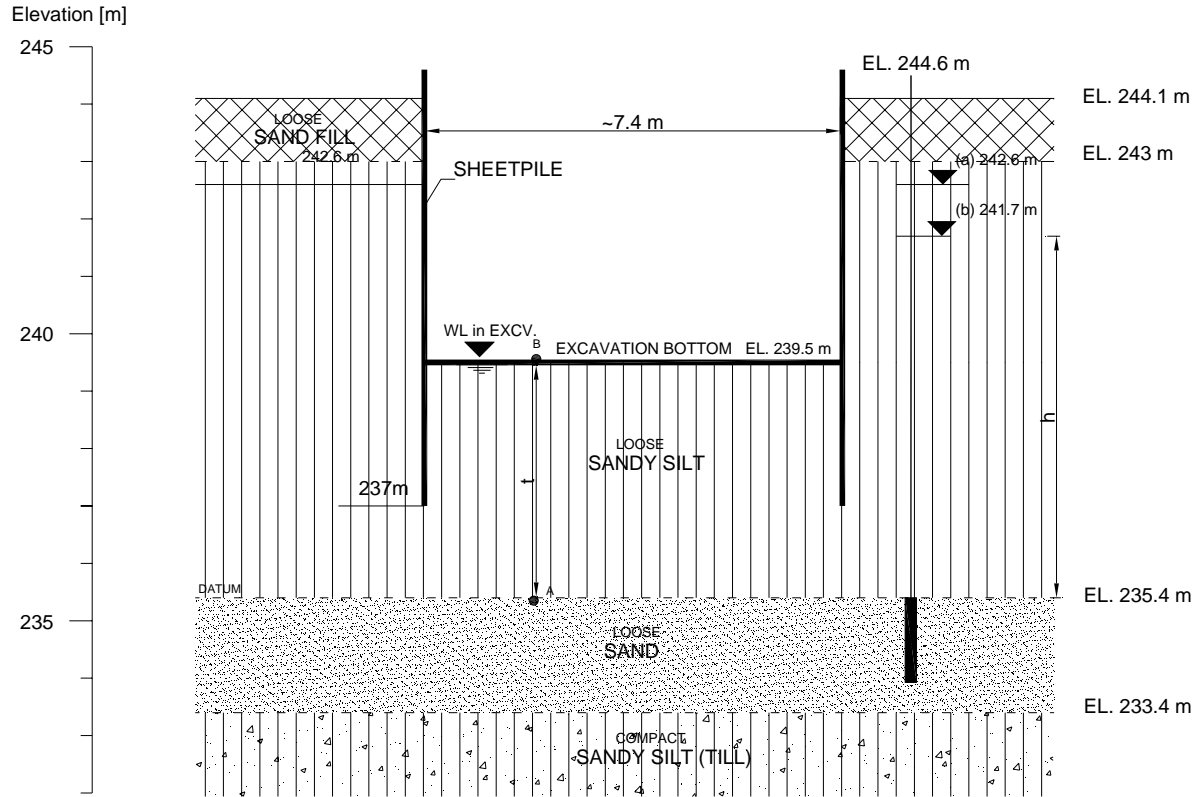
Cofferdam excavation in sandy silt overlaying a sand layer (Jacques Whitford's KB-06-3)
